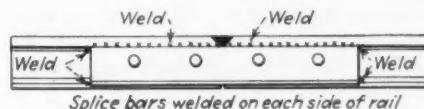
Elevation of 60-lb. rail joint showing method of welding
